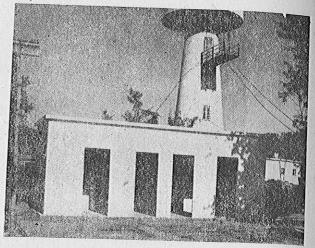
PROTOTYPE CONSTRUCTION COMPLETED
